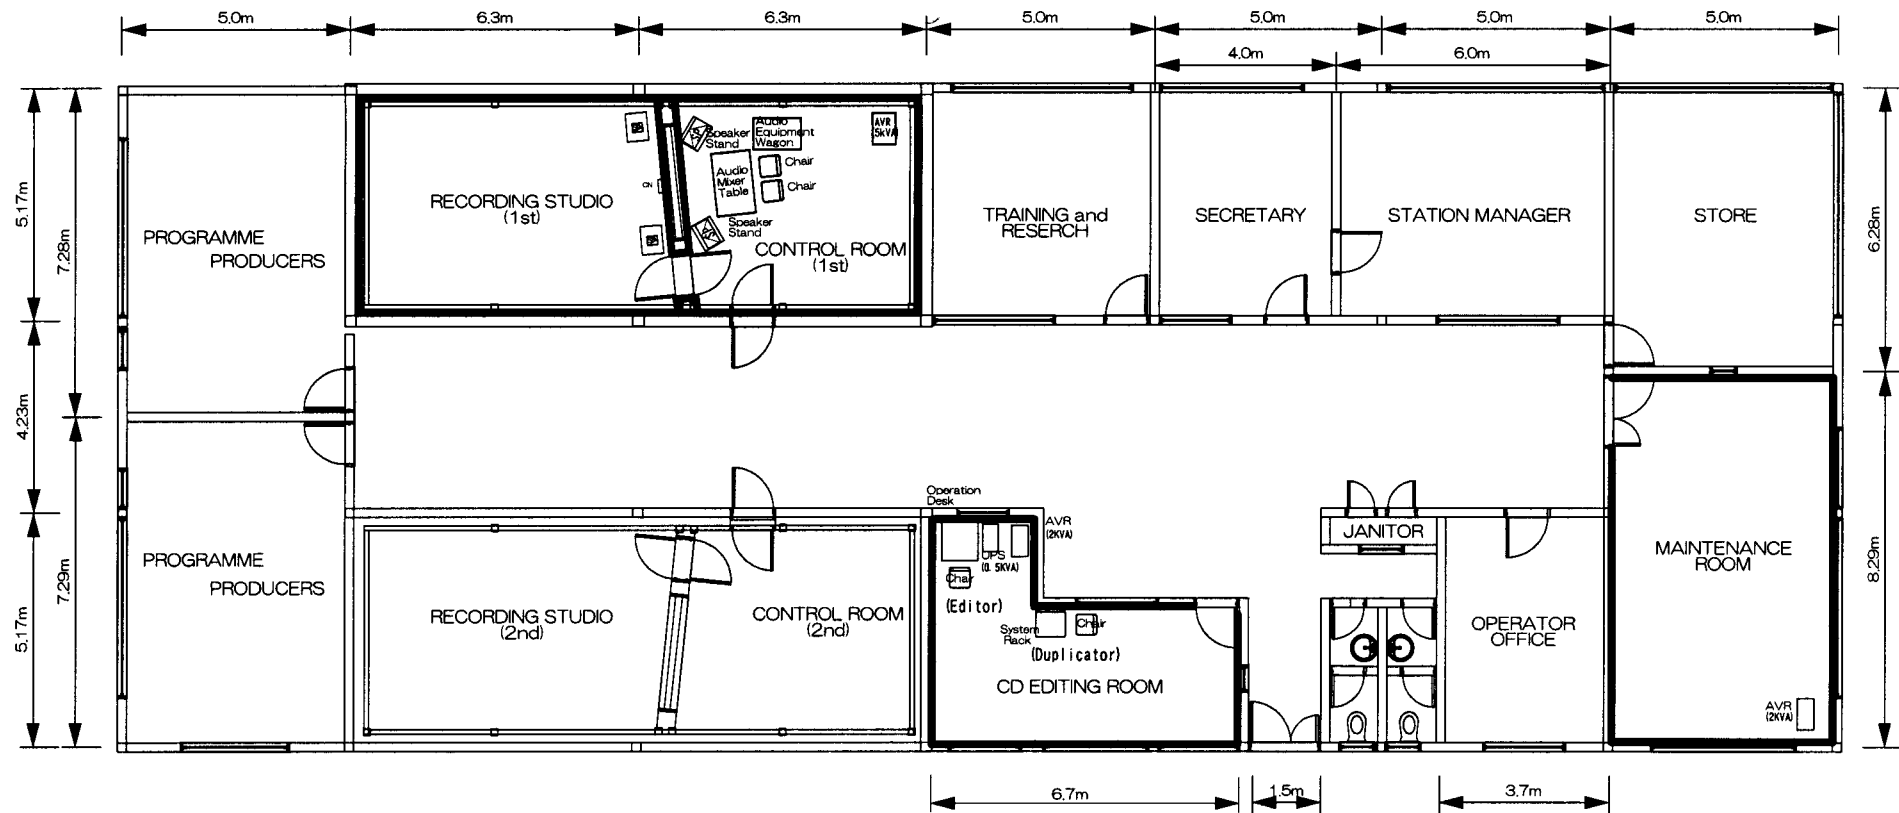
Floor Layout of Addis Ababa Radio Studio
